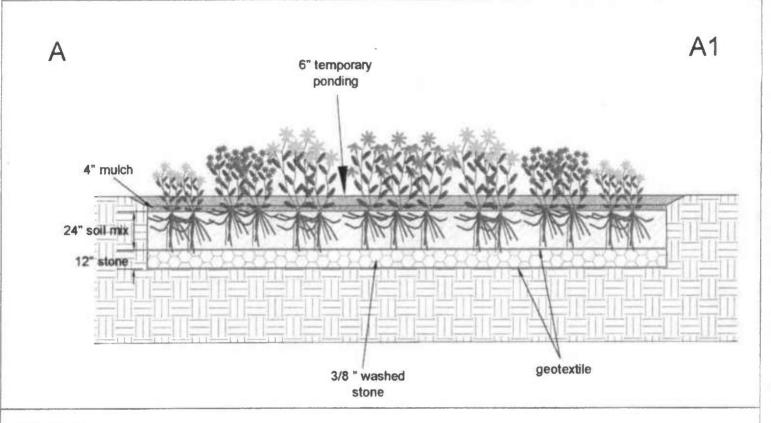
Stormwater Bioretention Facility & Buffer Management Plan Existing Conditions
